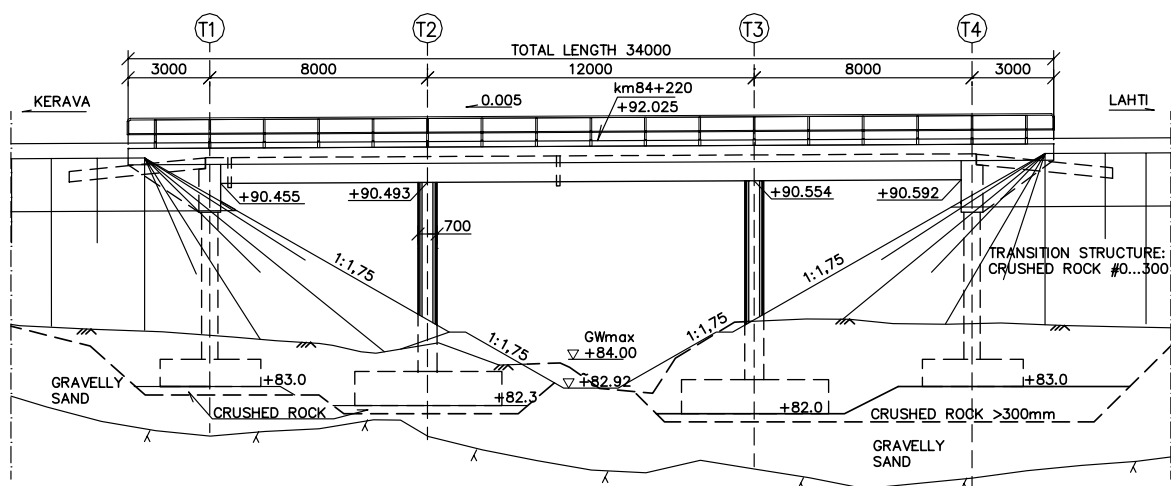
Main dimensions and elevation of Tekemjärvenoja Bridge (Laaksonen 2005).
